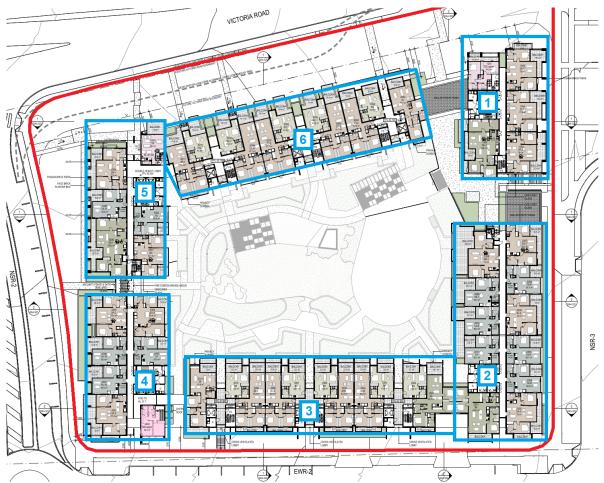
Proposed level 3 floor plan (blue lines defining buildings, red defines the development lot).
